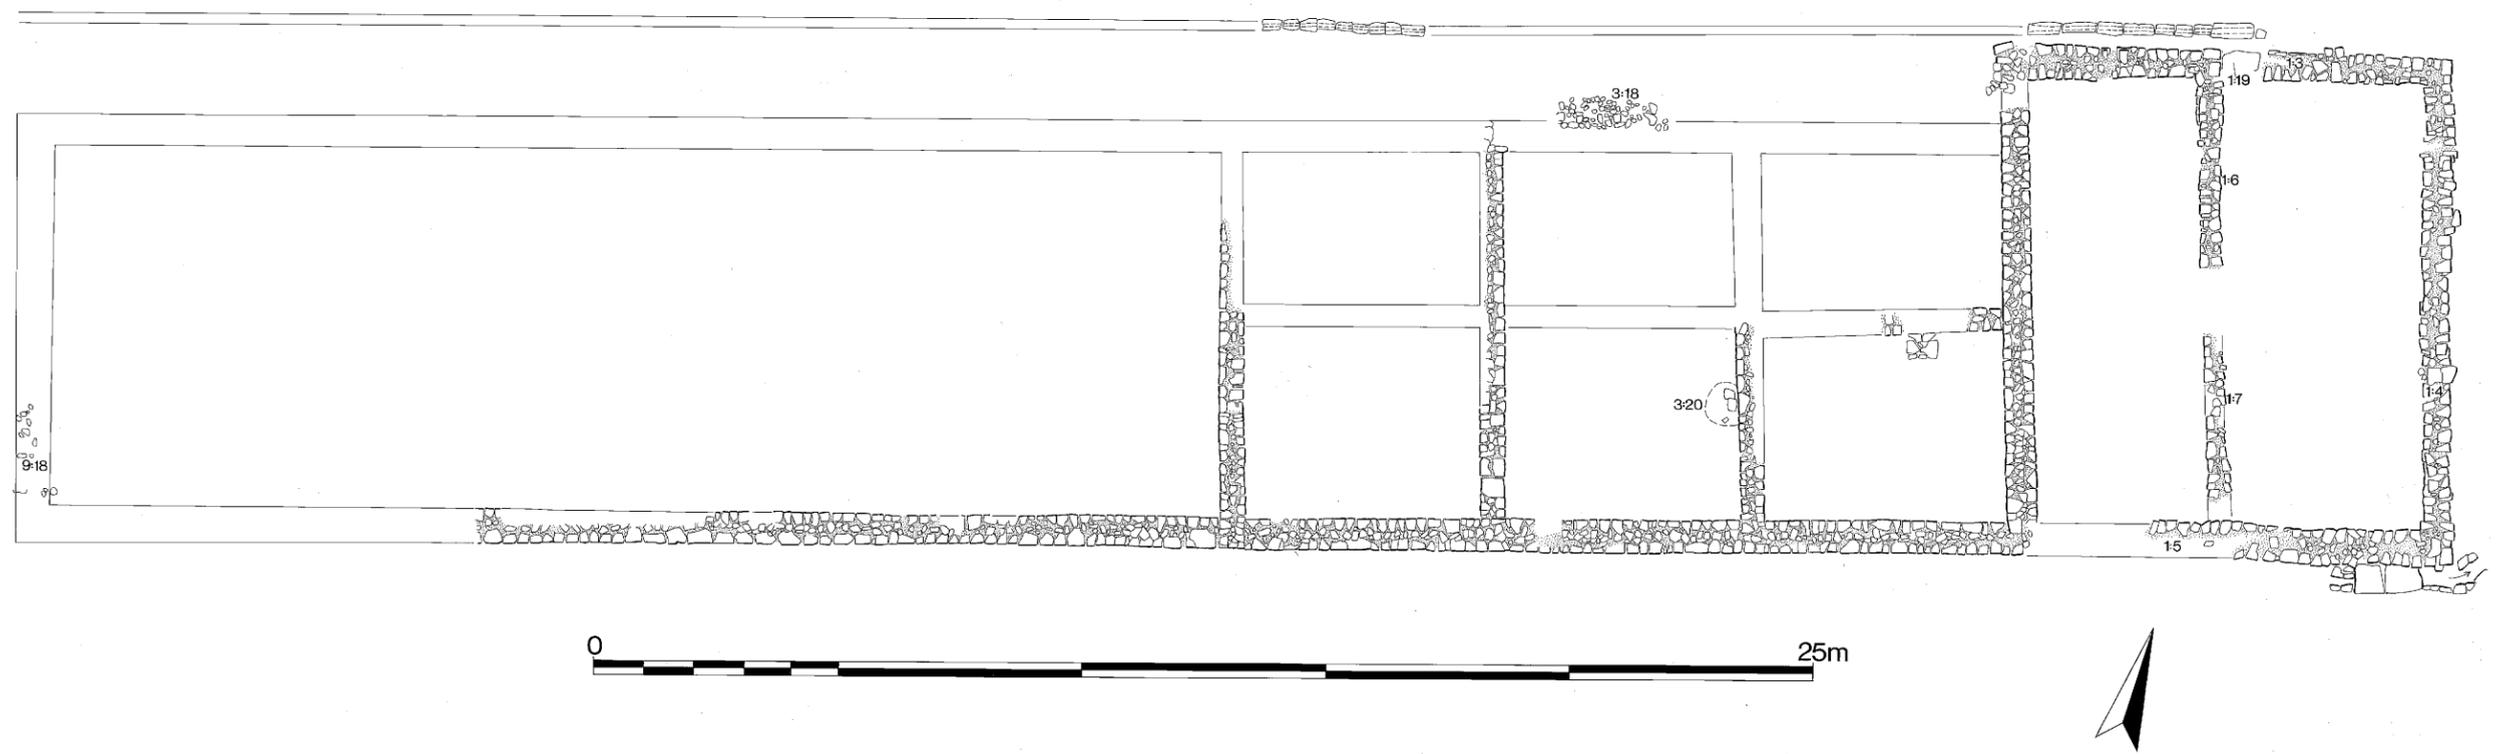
Plan of Building XIV Phase 2 (scale: 1:150).
